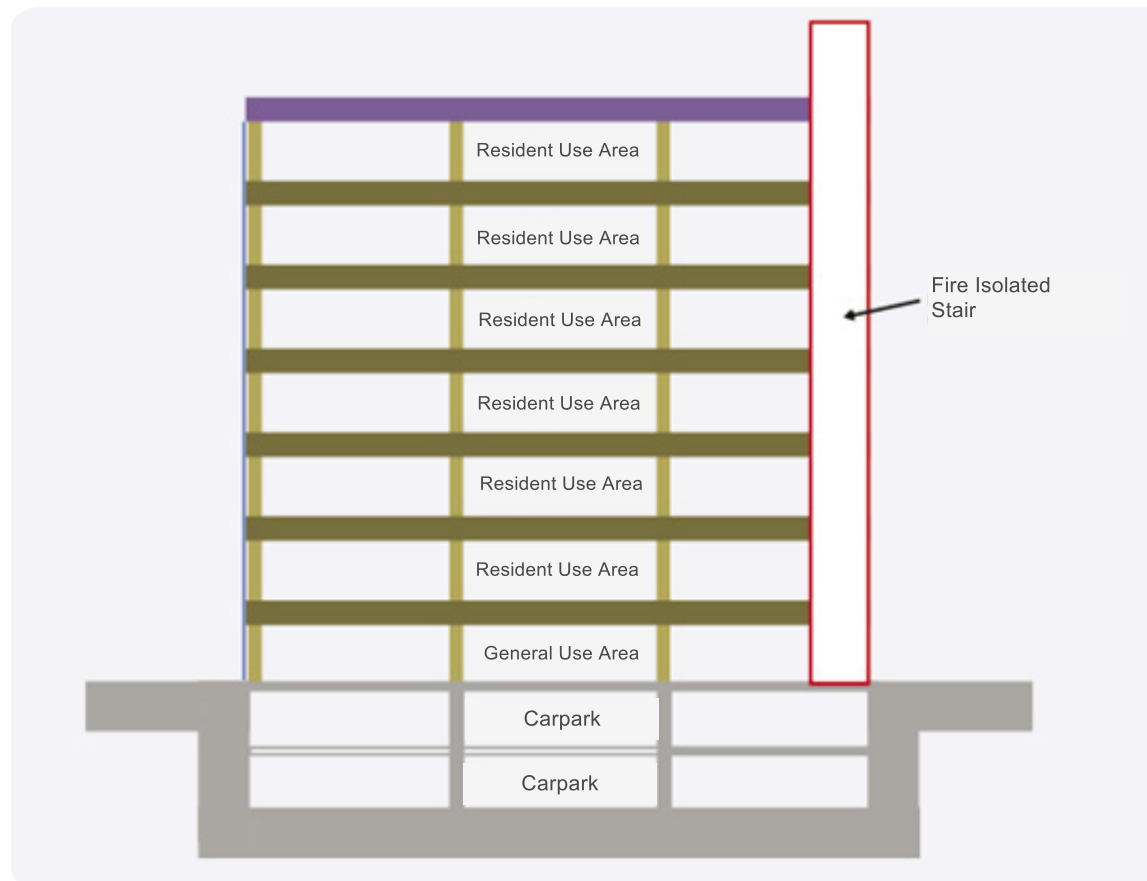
Typical Schematic Section through mid-rise Aged Care Building.
